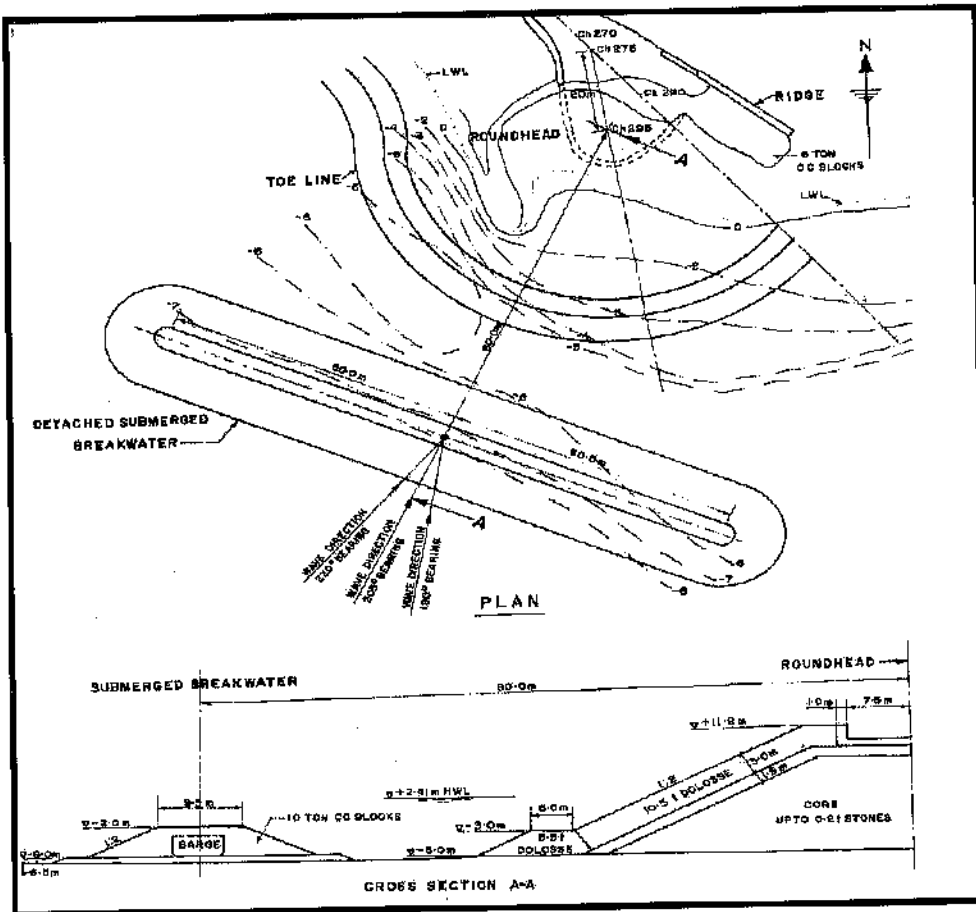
Submerged breakwater protection at Veraval Port, Gujarat, India
